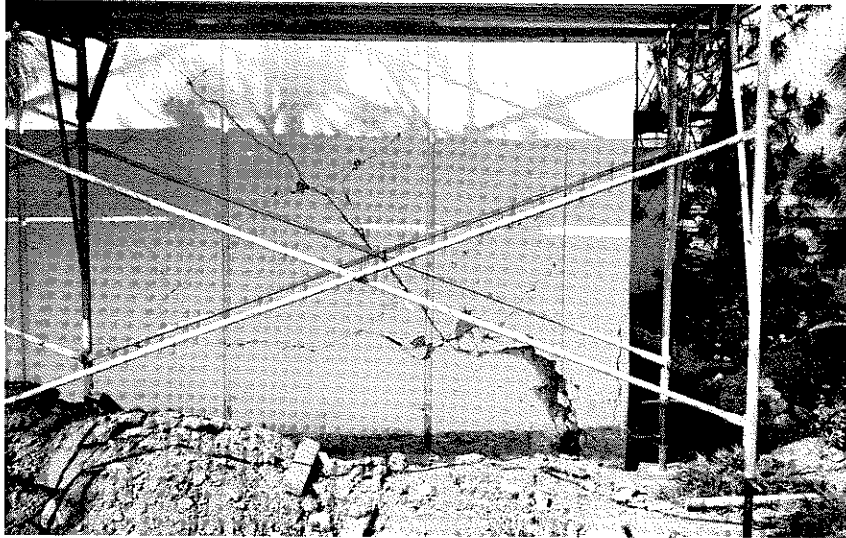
Cracking and spalling at the base of the eastern wall, south elevation of Indian Hills Medical Center.
